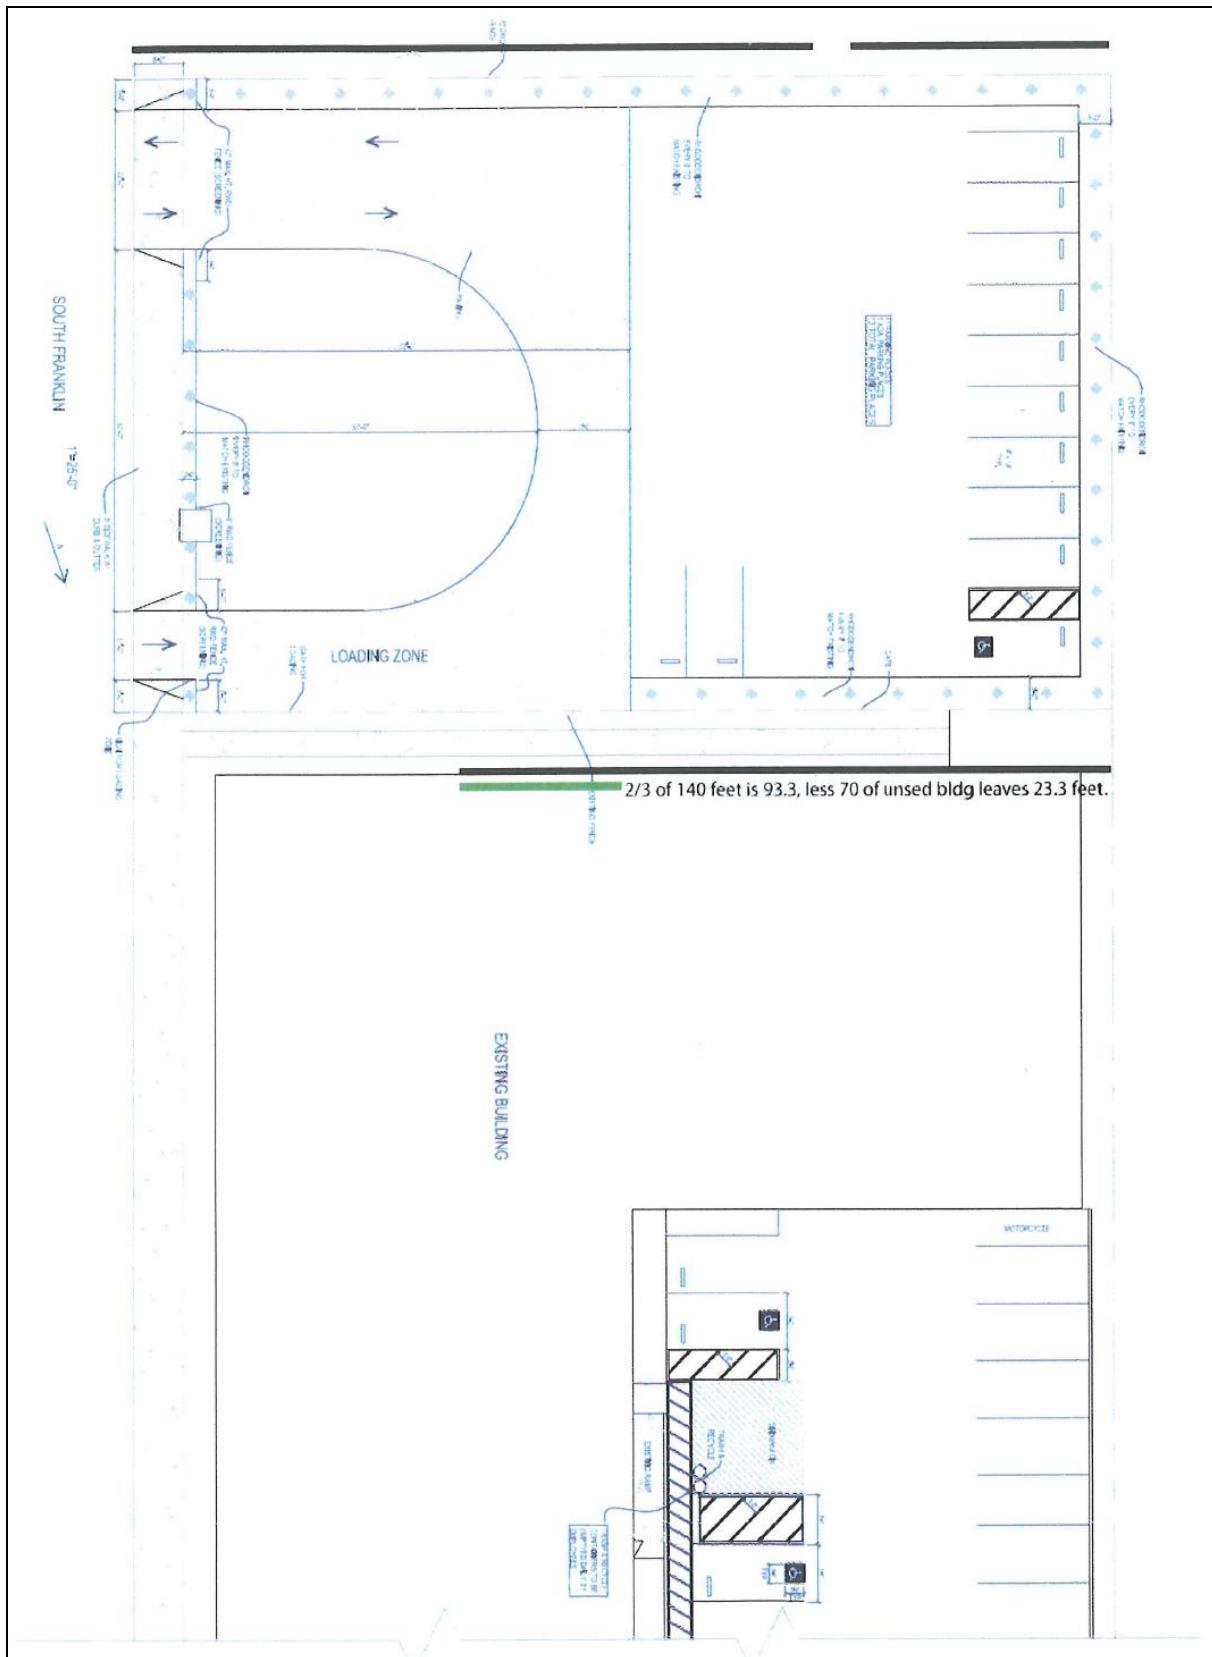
Site plan depicting how loading zone can be located in rear 2/3 of lot.
